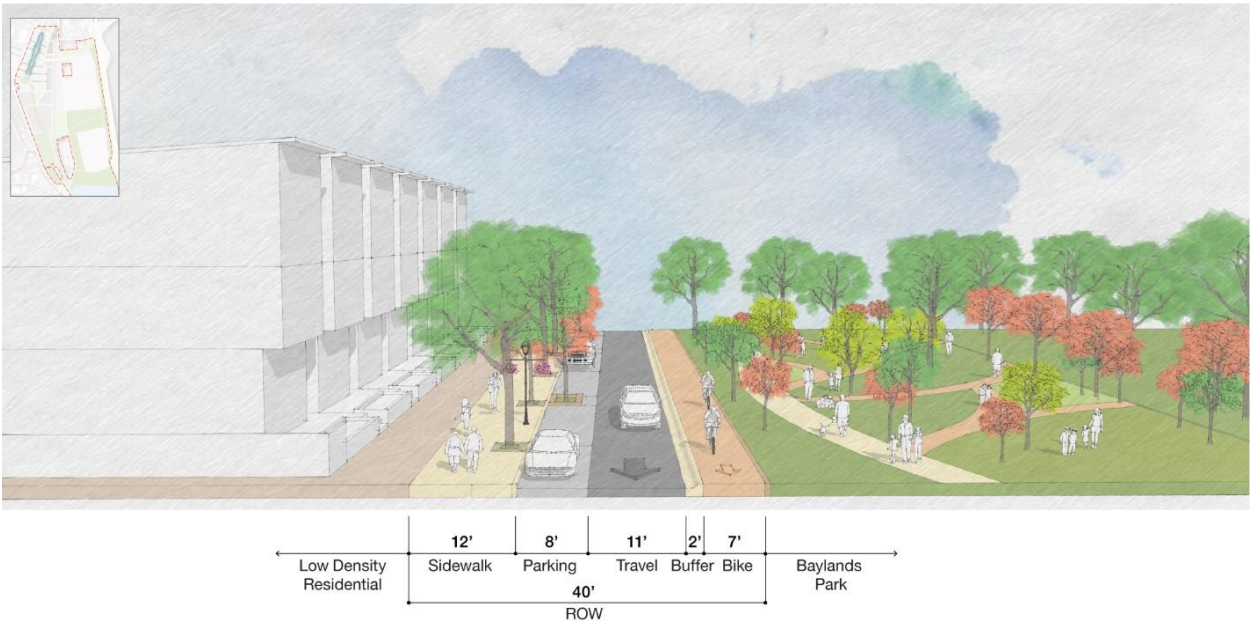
Roundhouse Circle Proposed Cross-Section
